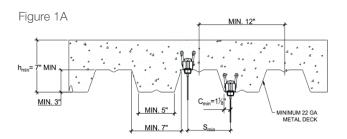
A shows spider in 3 inch profile metal deck with 4 inch of concrete topping thickness.
